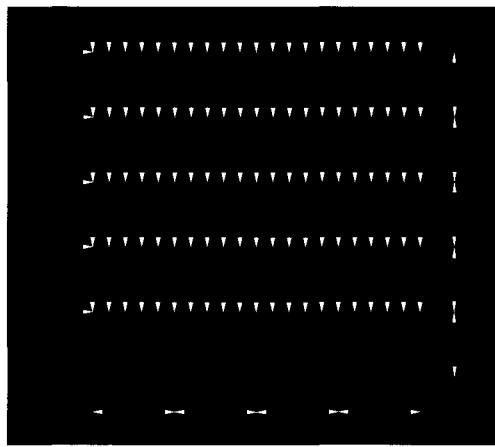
Geometry of 4-bay 5-story reinforced concrete plane frame
